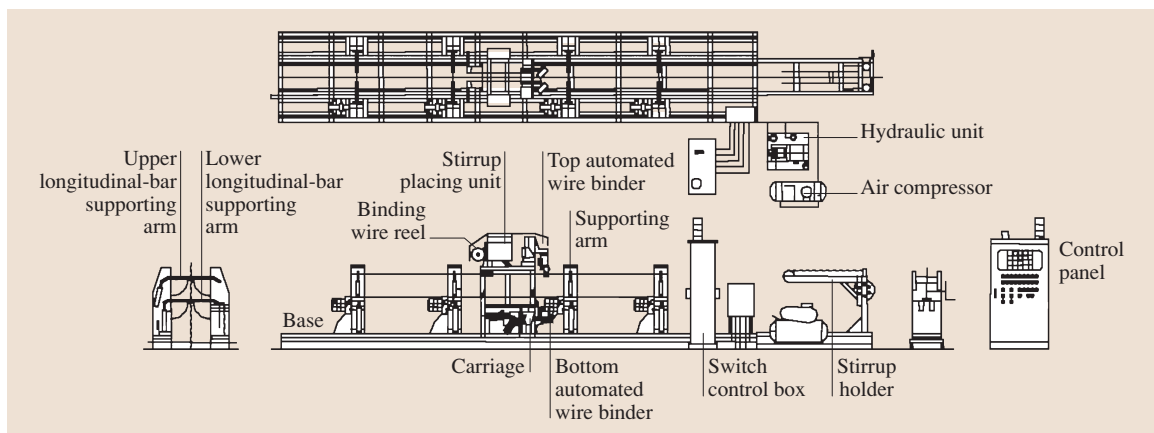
Robot for fabricating rebars for reinforced concrete buildings
